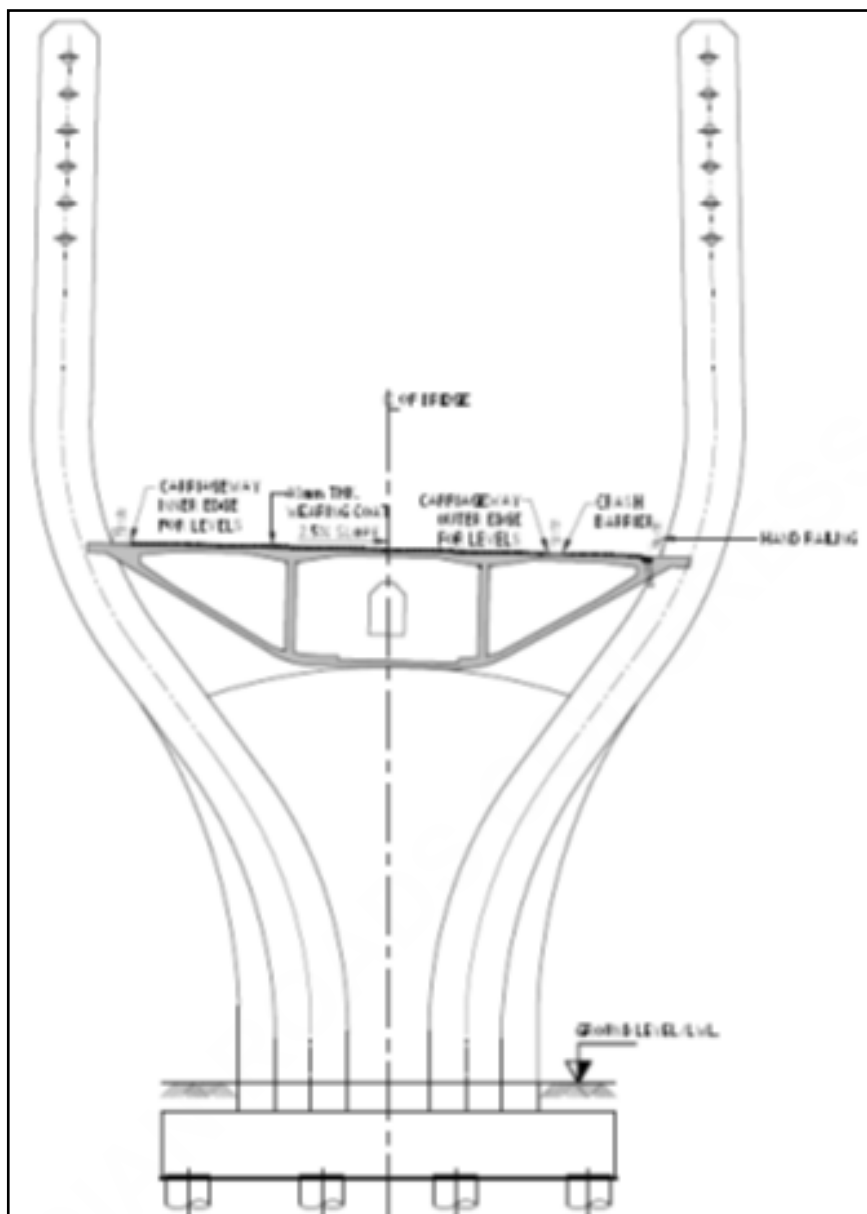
Typical single leaf lower pylon with cable in two planes
